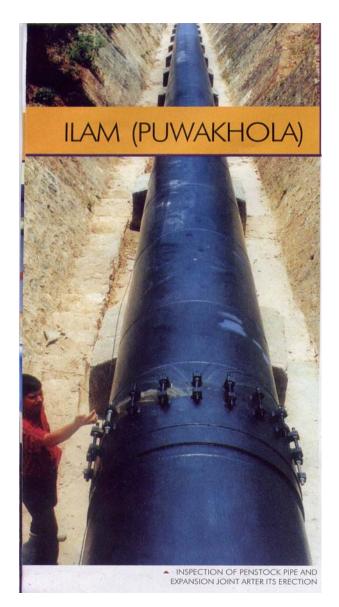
Penstock of Puwa Khola HPS showing Expansion Joint
